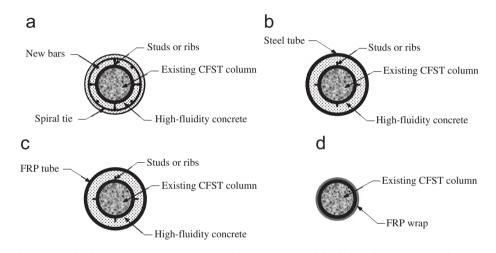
Solutions for repair or strengthening of CFST members. (a) Section enlargement with reinforced concrete jacketing, (b) section enlargement with steel tube and sandwiched concrete jacketing, (c) section enlargement with FRP tube and sandwiched concrete jacketing, (d) wrapping with FRP composites.
